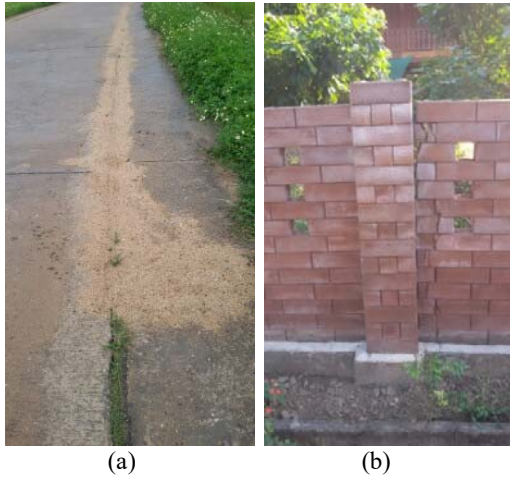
(a) Sand ejected through the joints of concrete pavement, (b) Separation of a wall made from interlocking bricks due to ground settlement.
